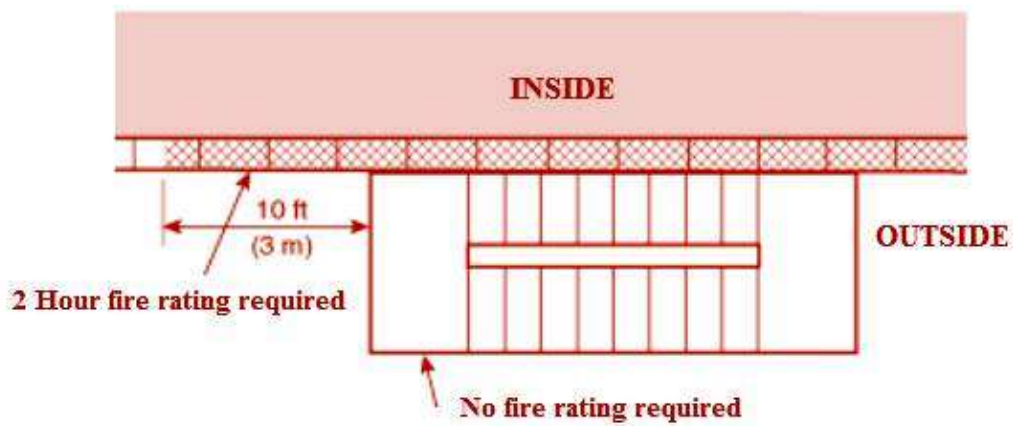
b.: Outside stair with exterior wall protruding outside the building
